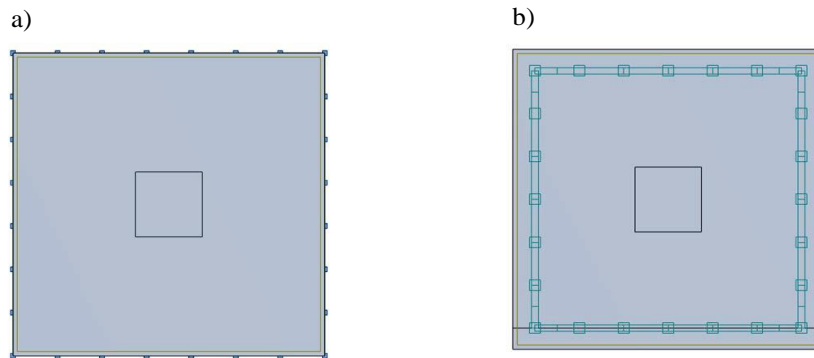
Horizontal cross-section of the analyzed tall building (a) shaft system with columns at the edge of the building, (b) shaft system with columns shifted by 1.0m to the inside of the building
